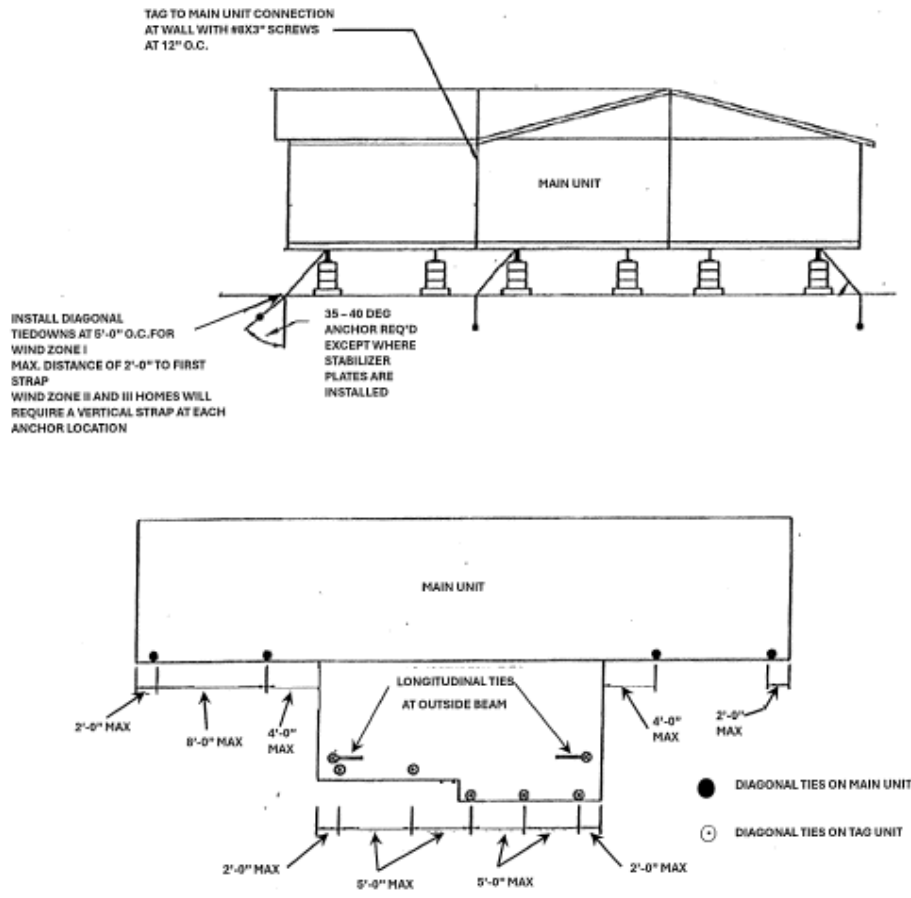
Typical Anchor Locations and Spacings for a Tag Unit.
